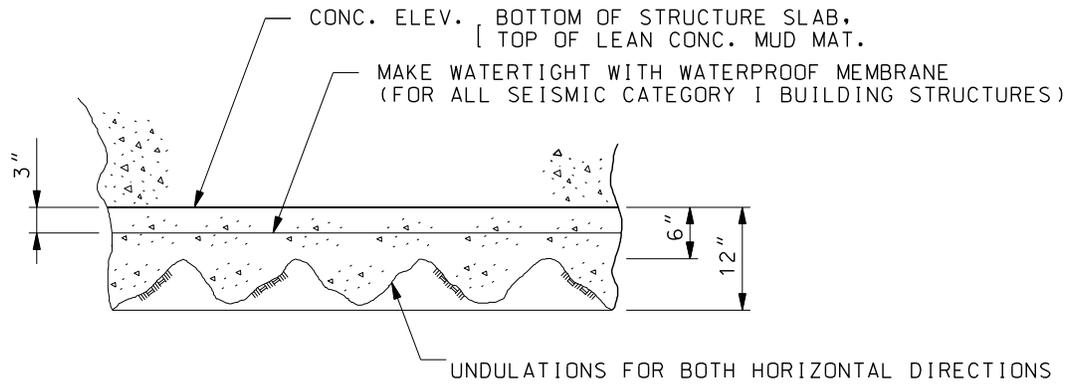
Typical Detail for Installation of Waterproofing Membrane
